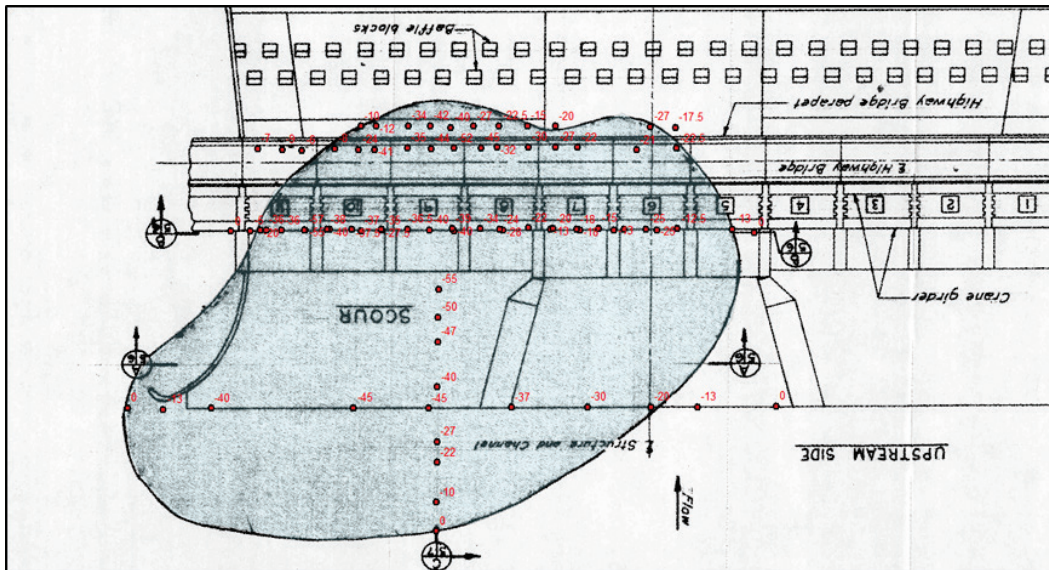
Elevation contour map of the scour zone in the forebay and beneath the structure. Plan view is looking downstream from forebay.
